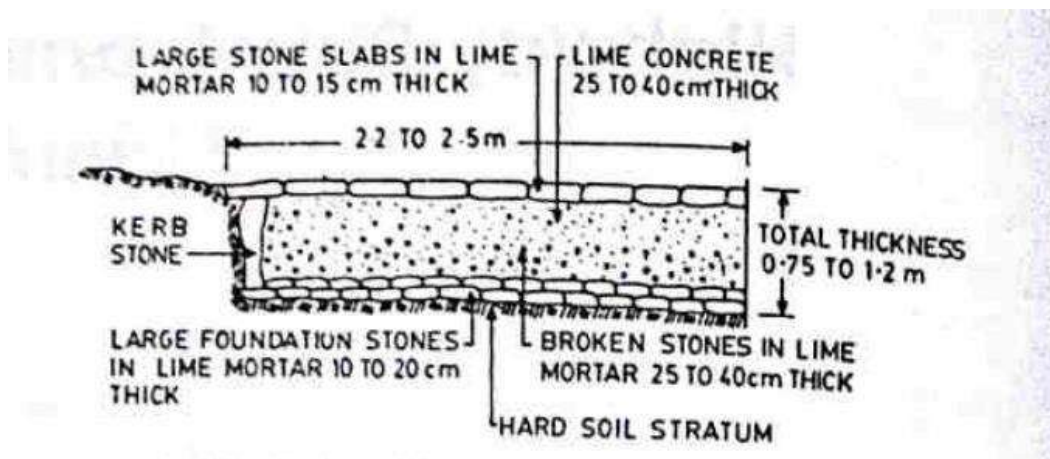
Roman road construction (Highway Engineering by: Khanna and Justo)
